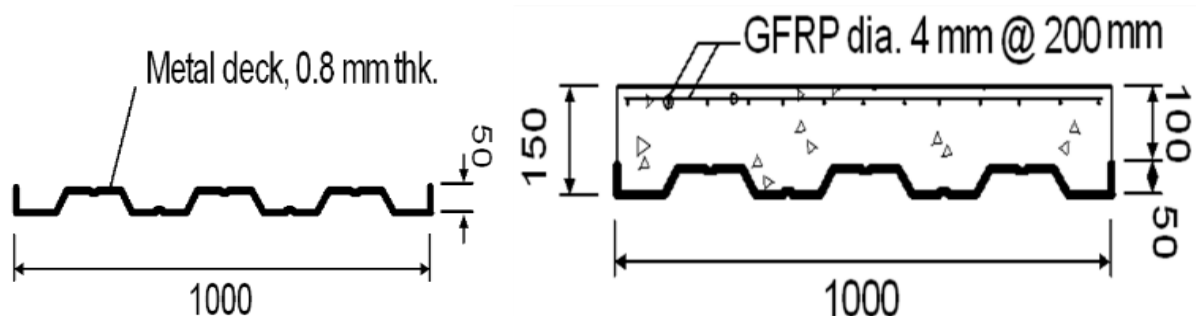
Schematic view of (a) metal deck, and (b) cross section of concrete slab-deck system (units: mm).
